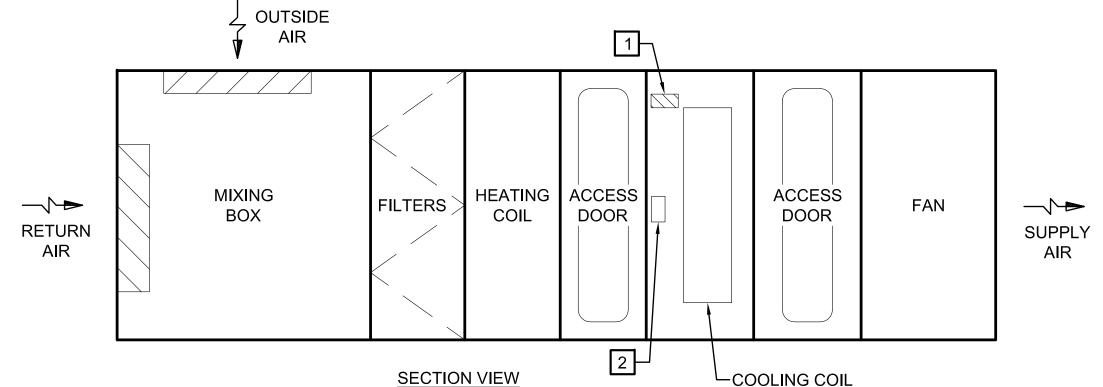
BI DEVICE MODULE ASSEMBLY
